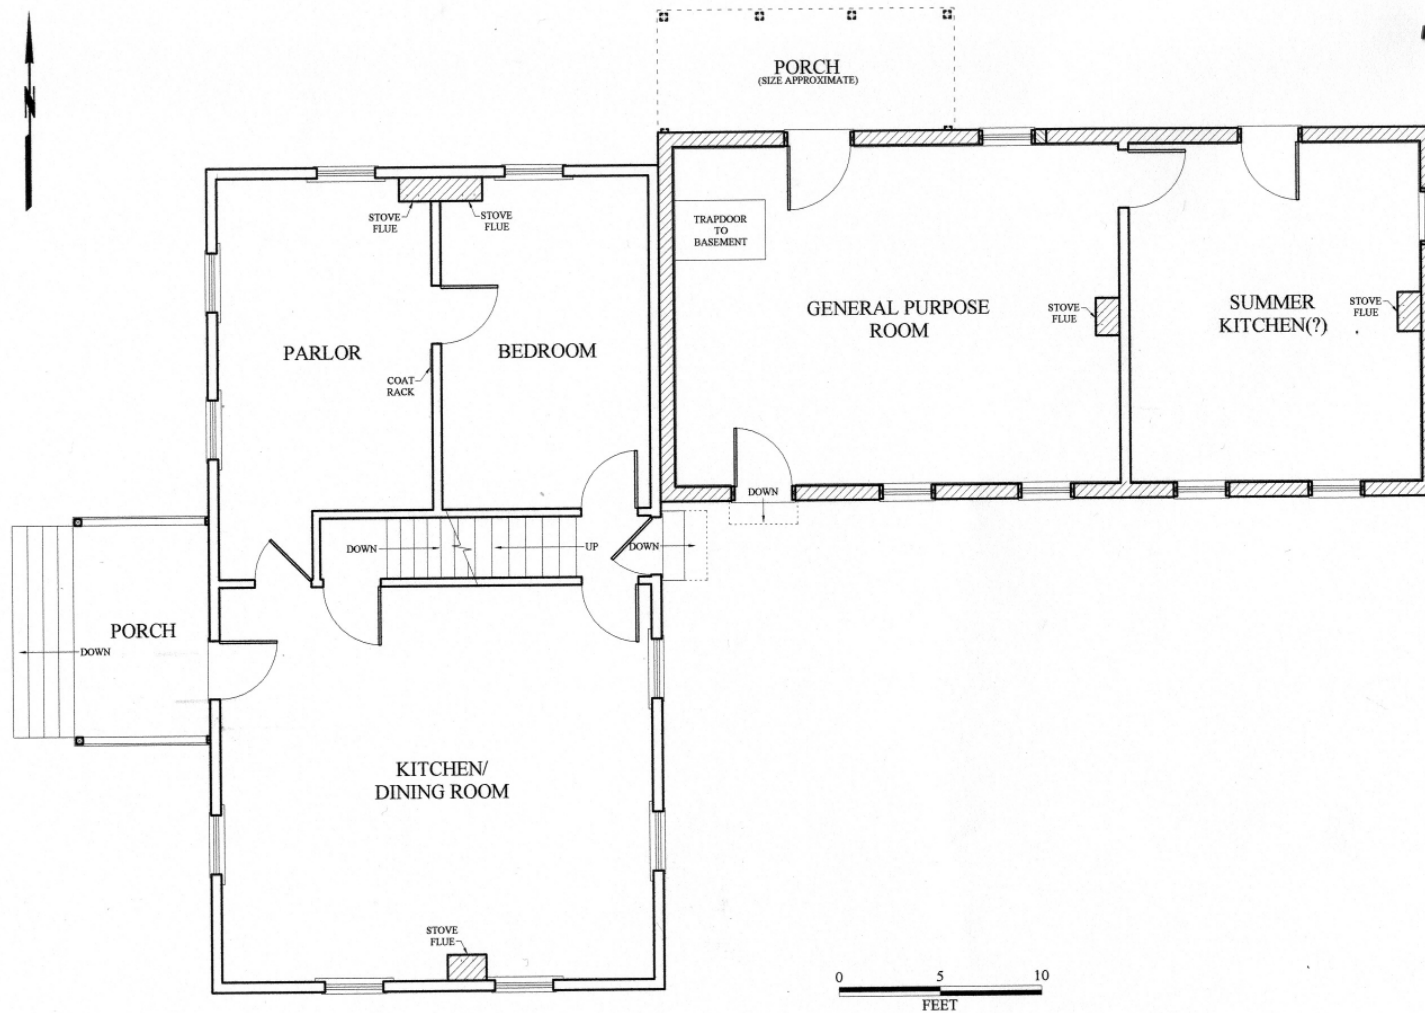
Ground story floor plan of the Roman-Seibert House, circa 1900. At about this time, the house occupied by, or just vacated by, the Albert Baer family.
